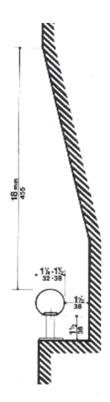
Size and Spacing of Handrails and Grab Bars Handrail
